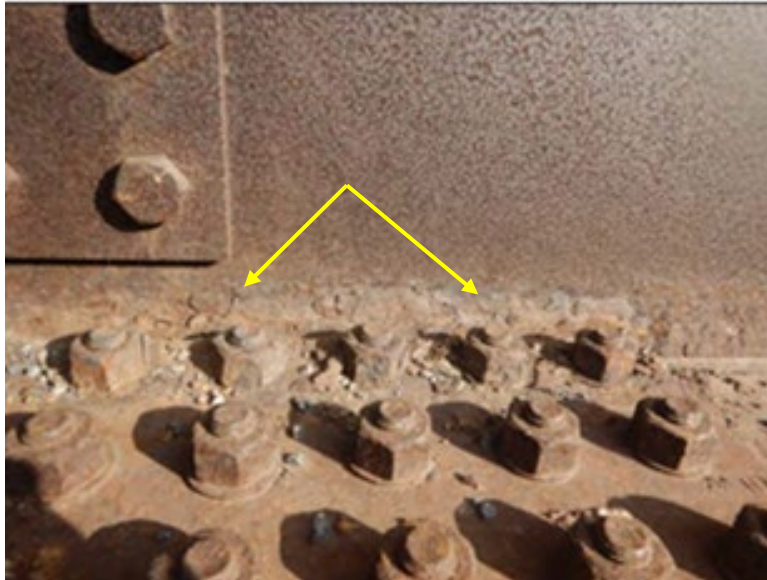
Exterior Girder Web Corrosion at Top Plate of Bottom Splice
